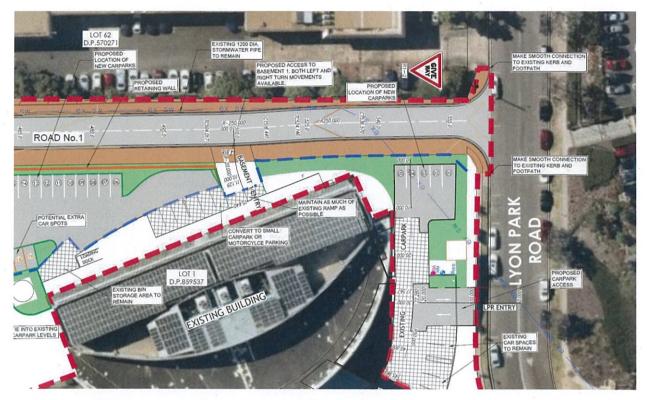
Engineering plan detailing the connection to Lyonpark Road
